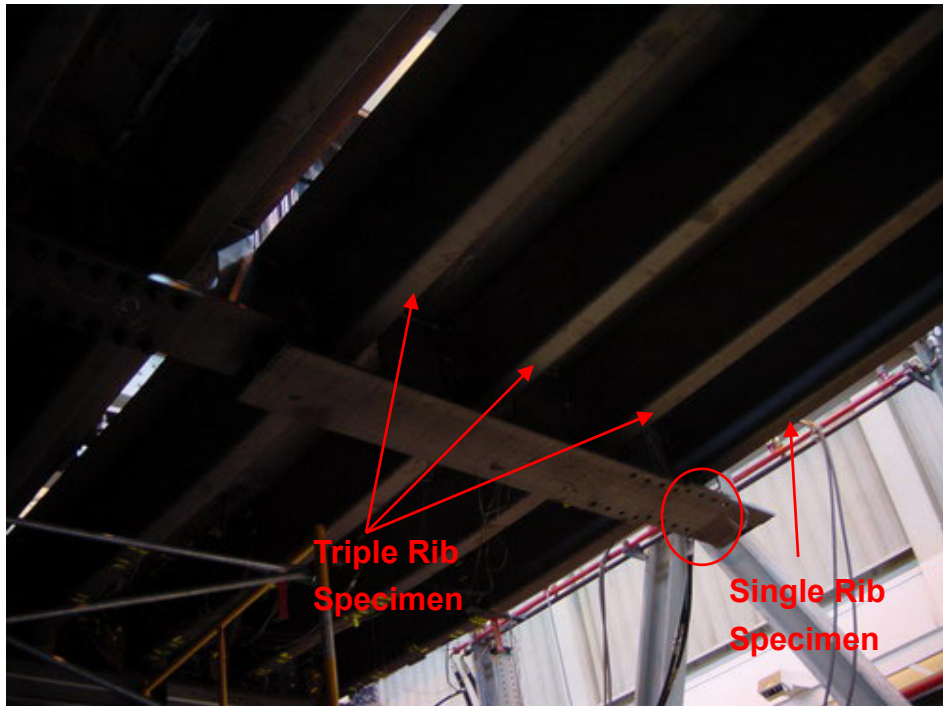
Appearance of Single and Triple-rib Beams after Testing Viewed from Below
